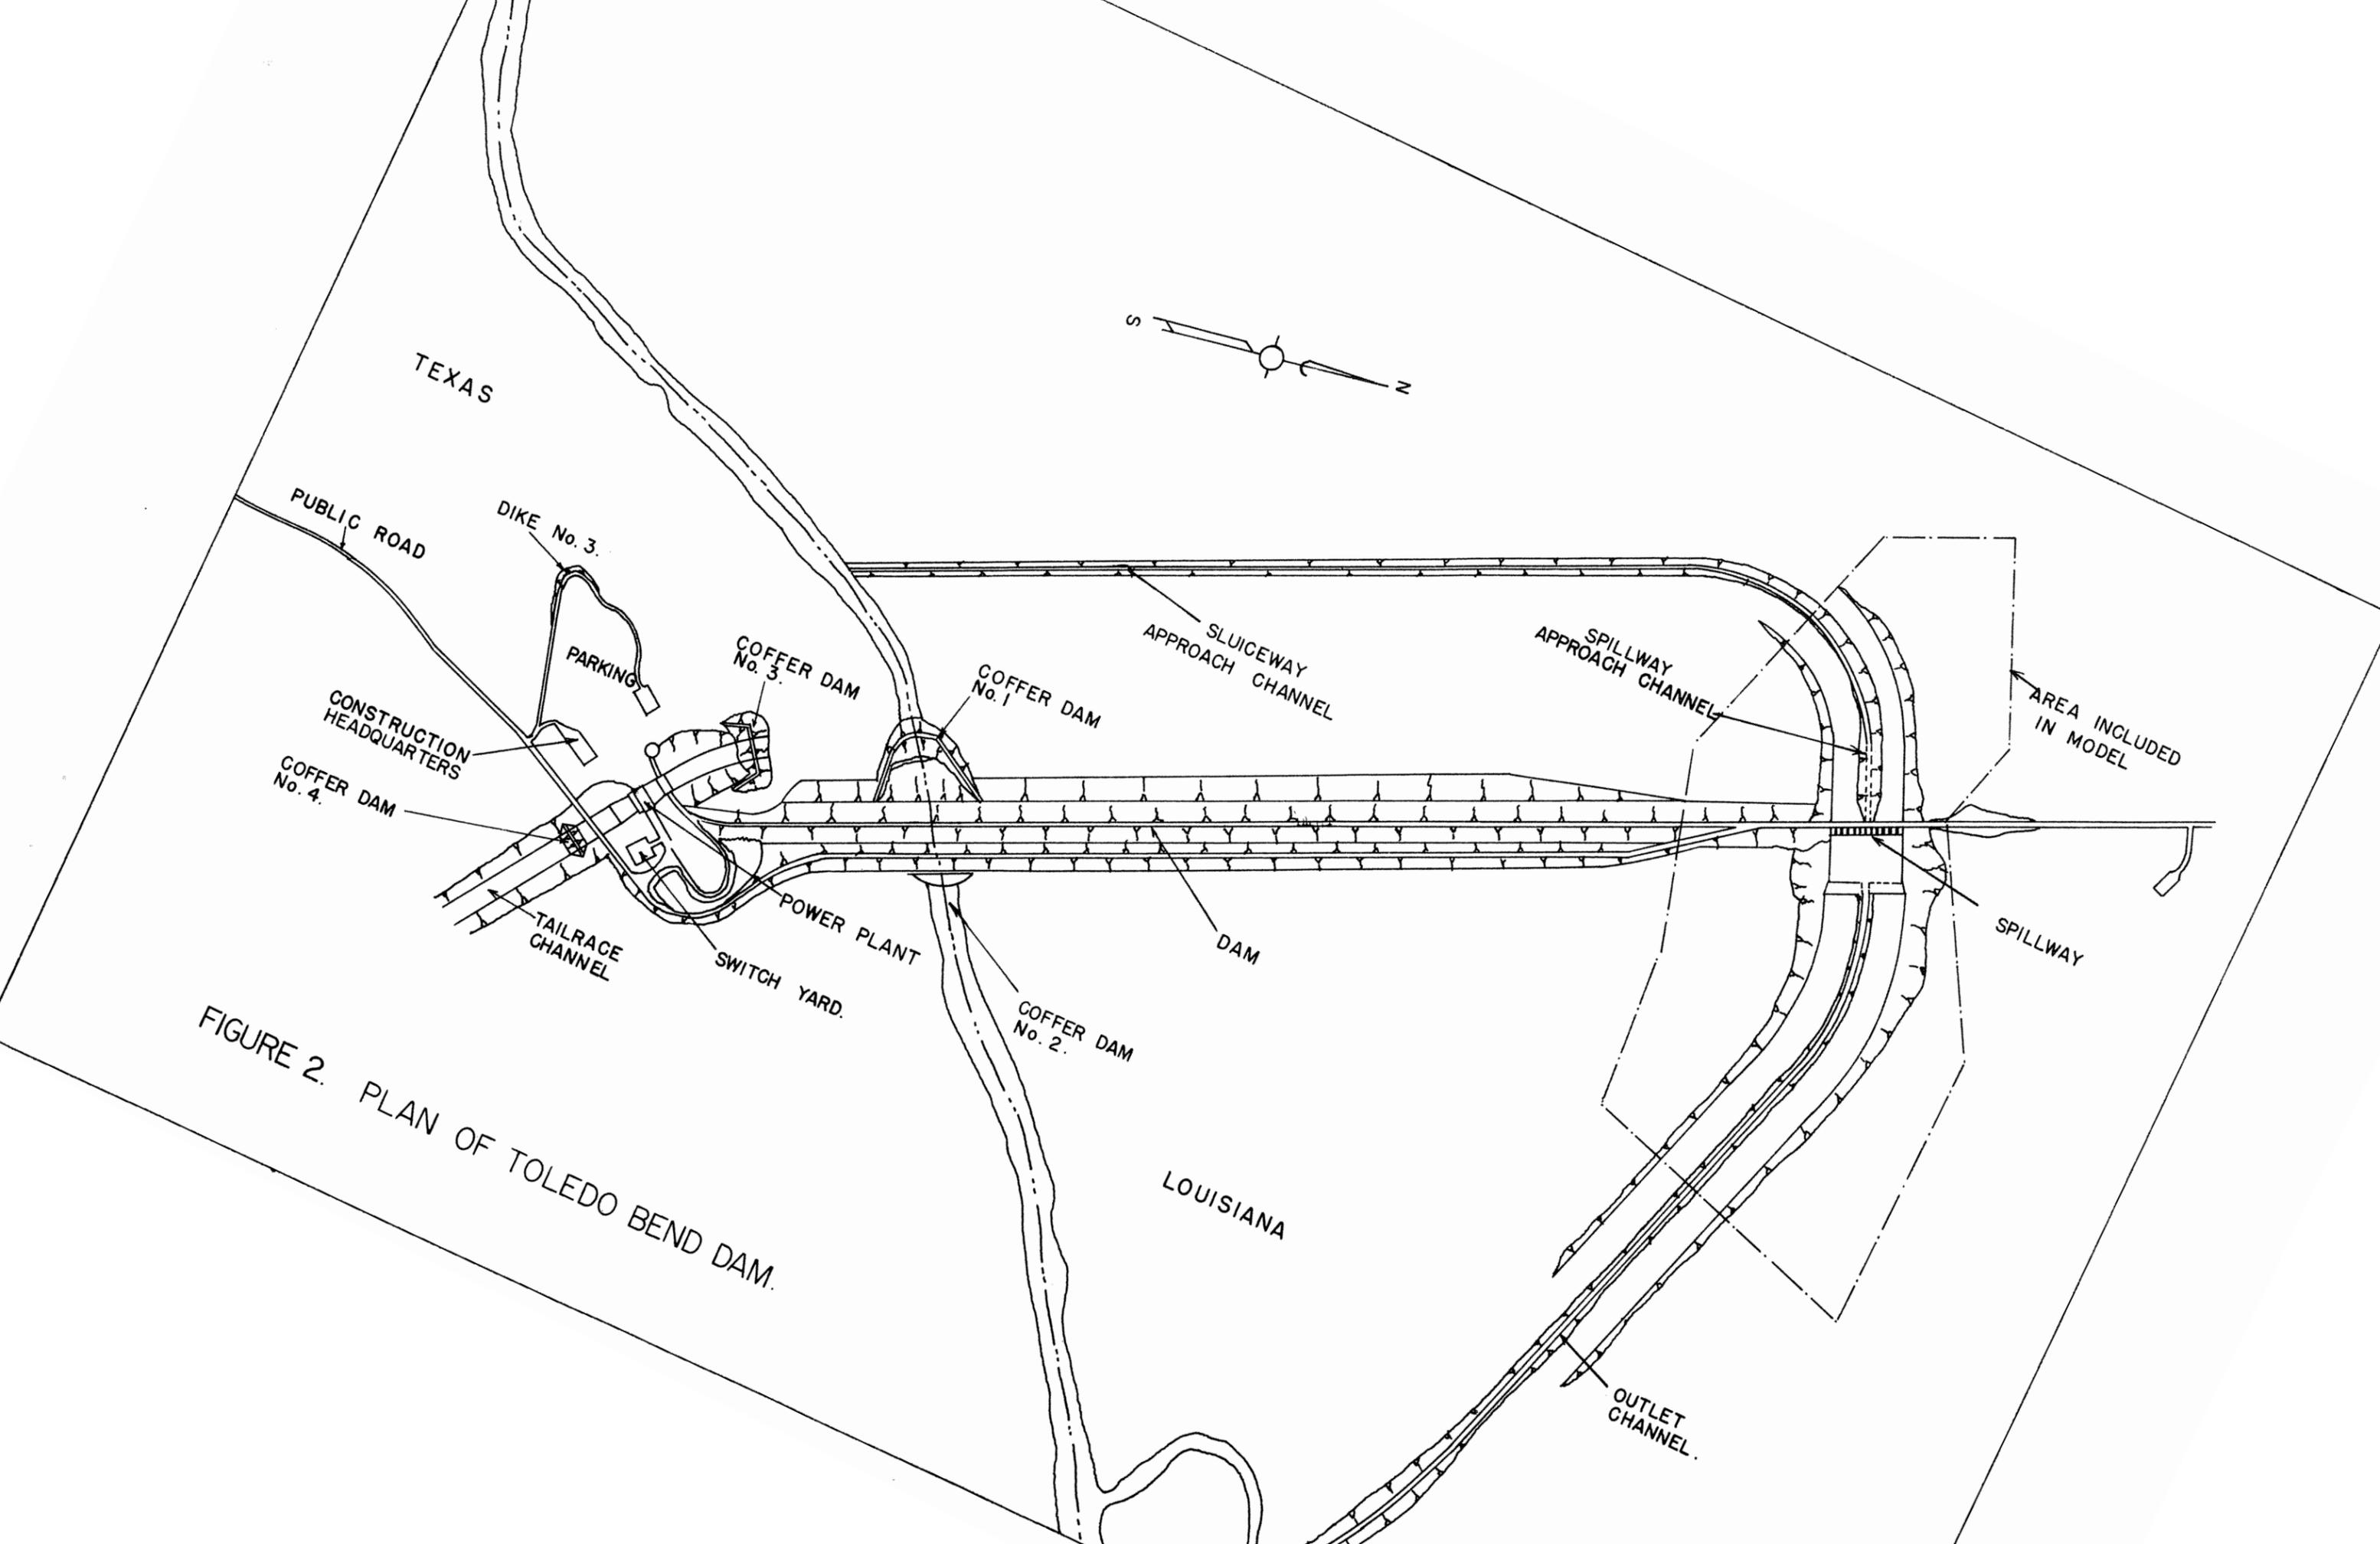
PLAN OF TOLEDO BEND DAM.
